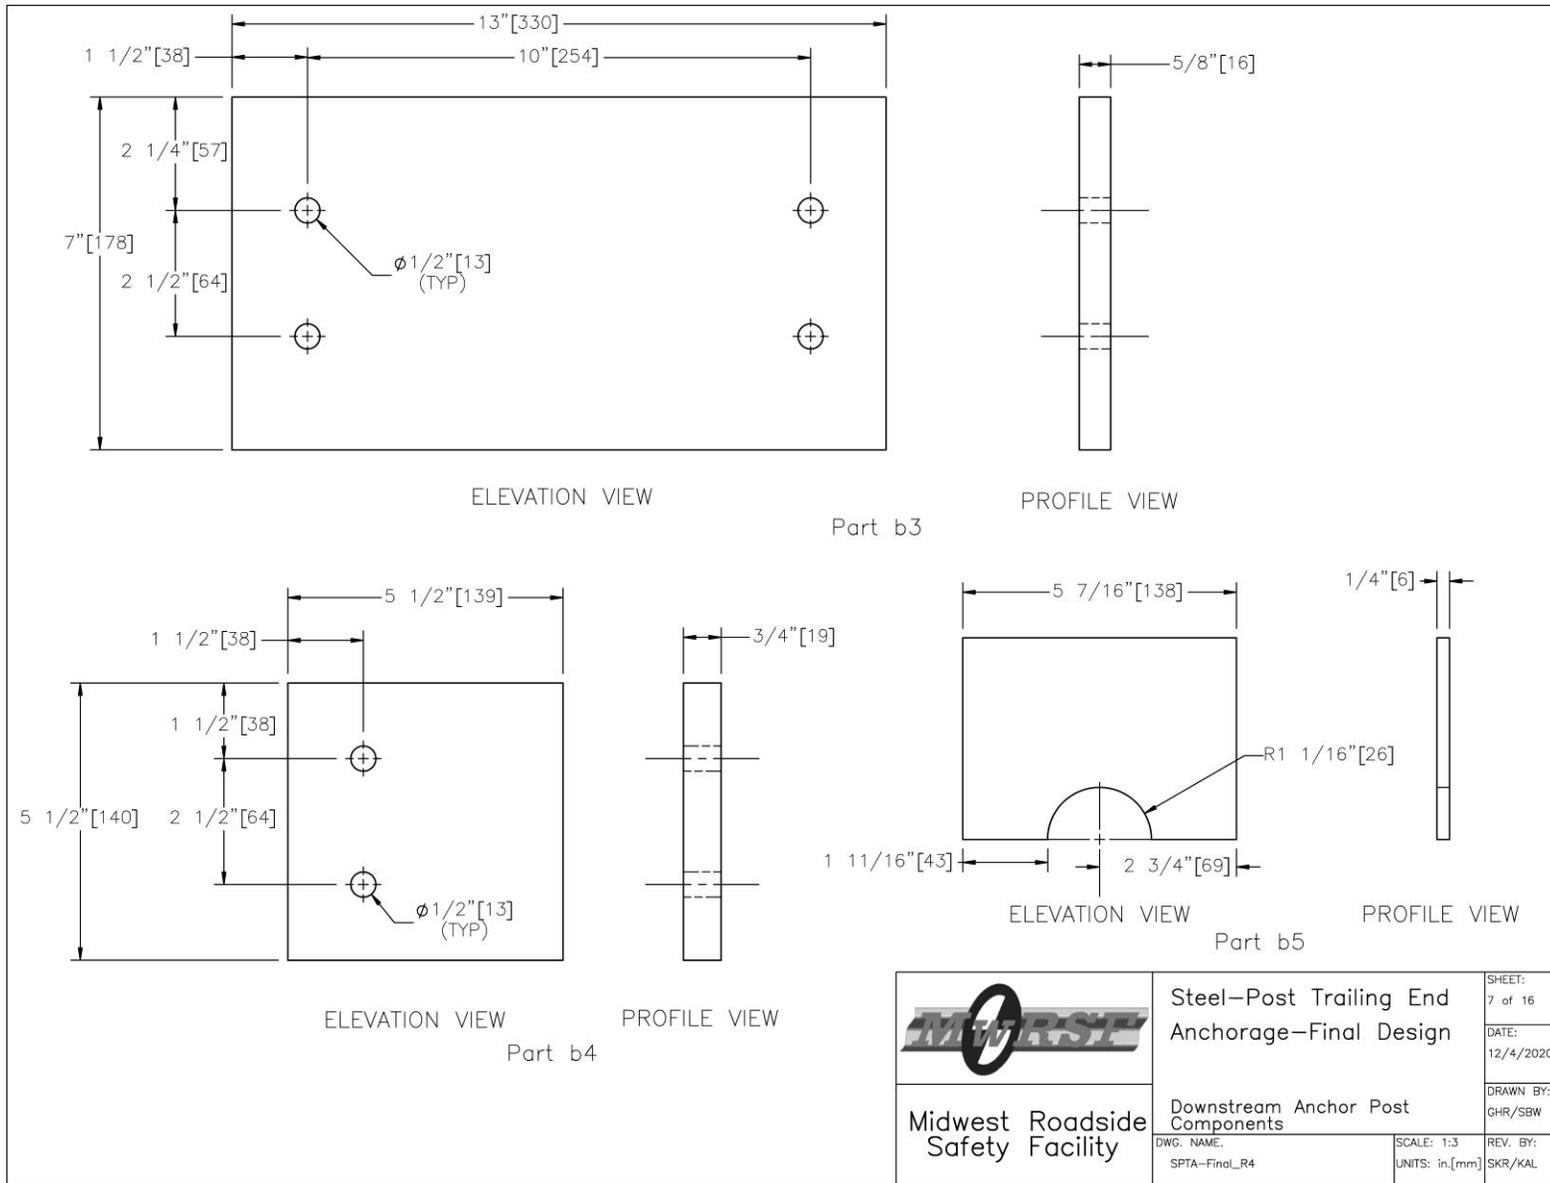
Steel-Post Trailing End Anchorage, Downstream Anchor Post Components
